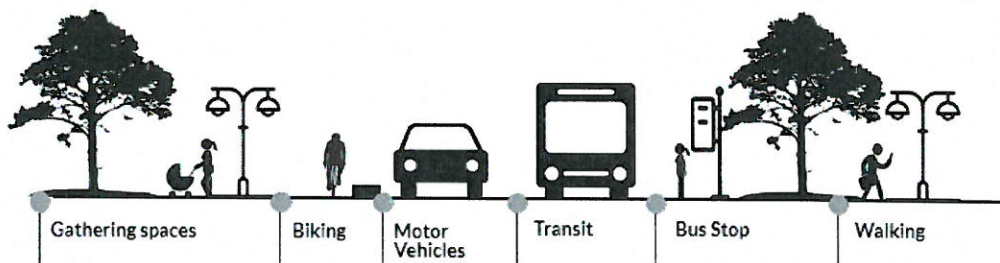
EXAMPLE OF A COMPLETE STREET LAYOUT
